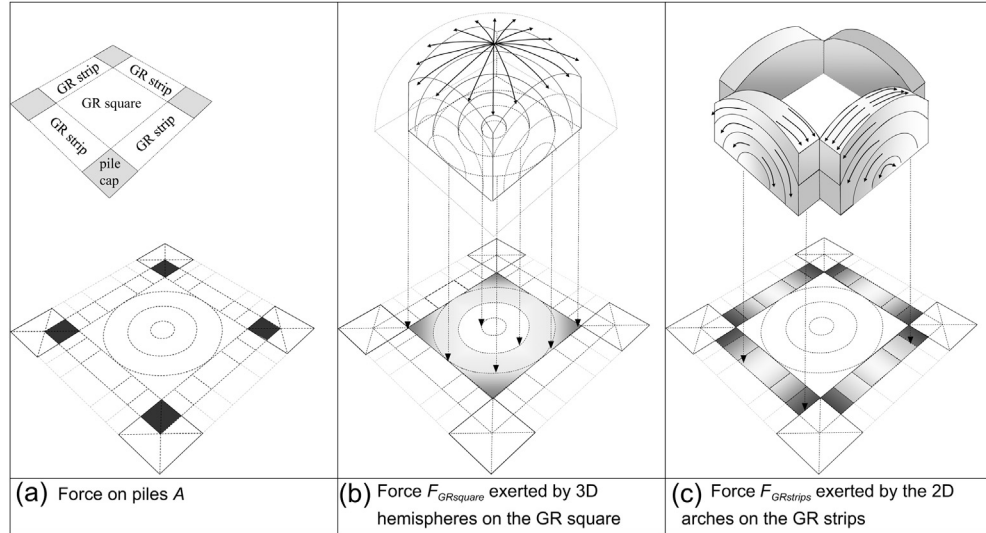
Distribution of the load on the geo-reinforcement area between the piles and the determination of arching part going to the pile (van Eekelen et al., 2013)
